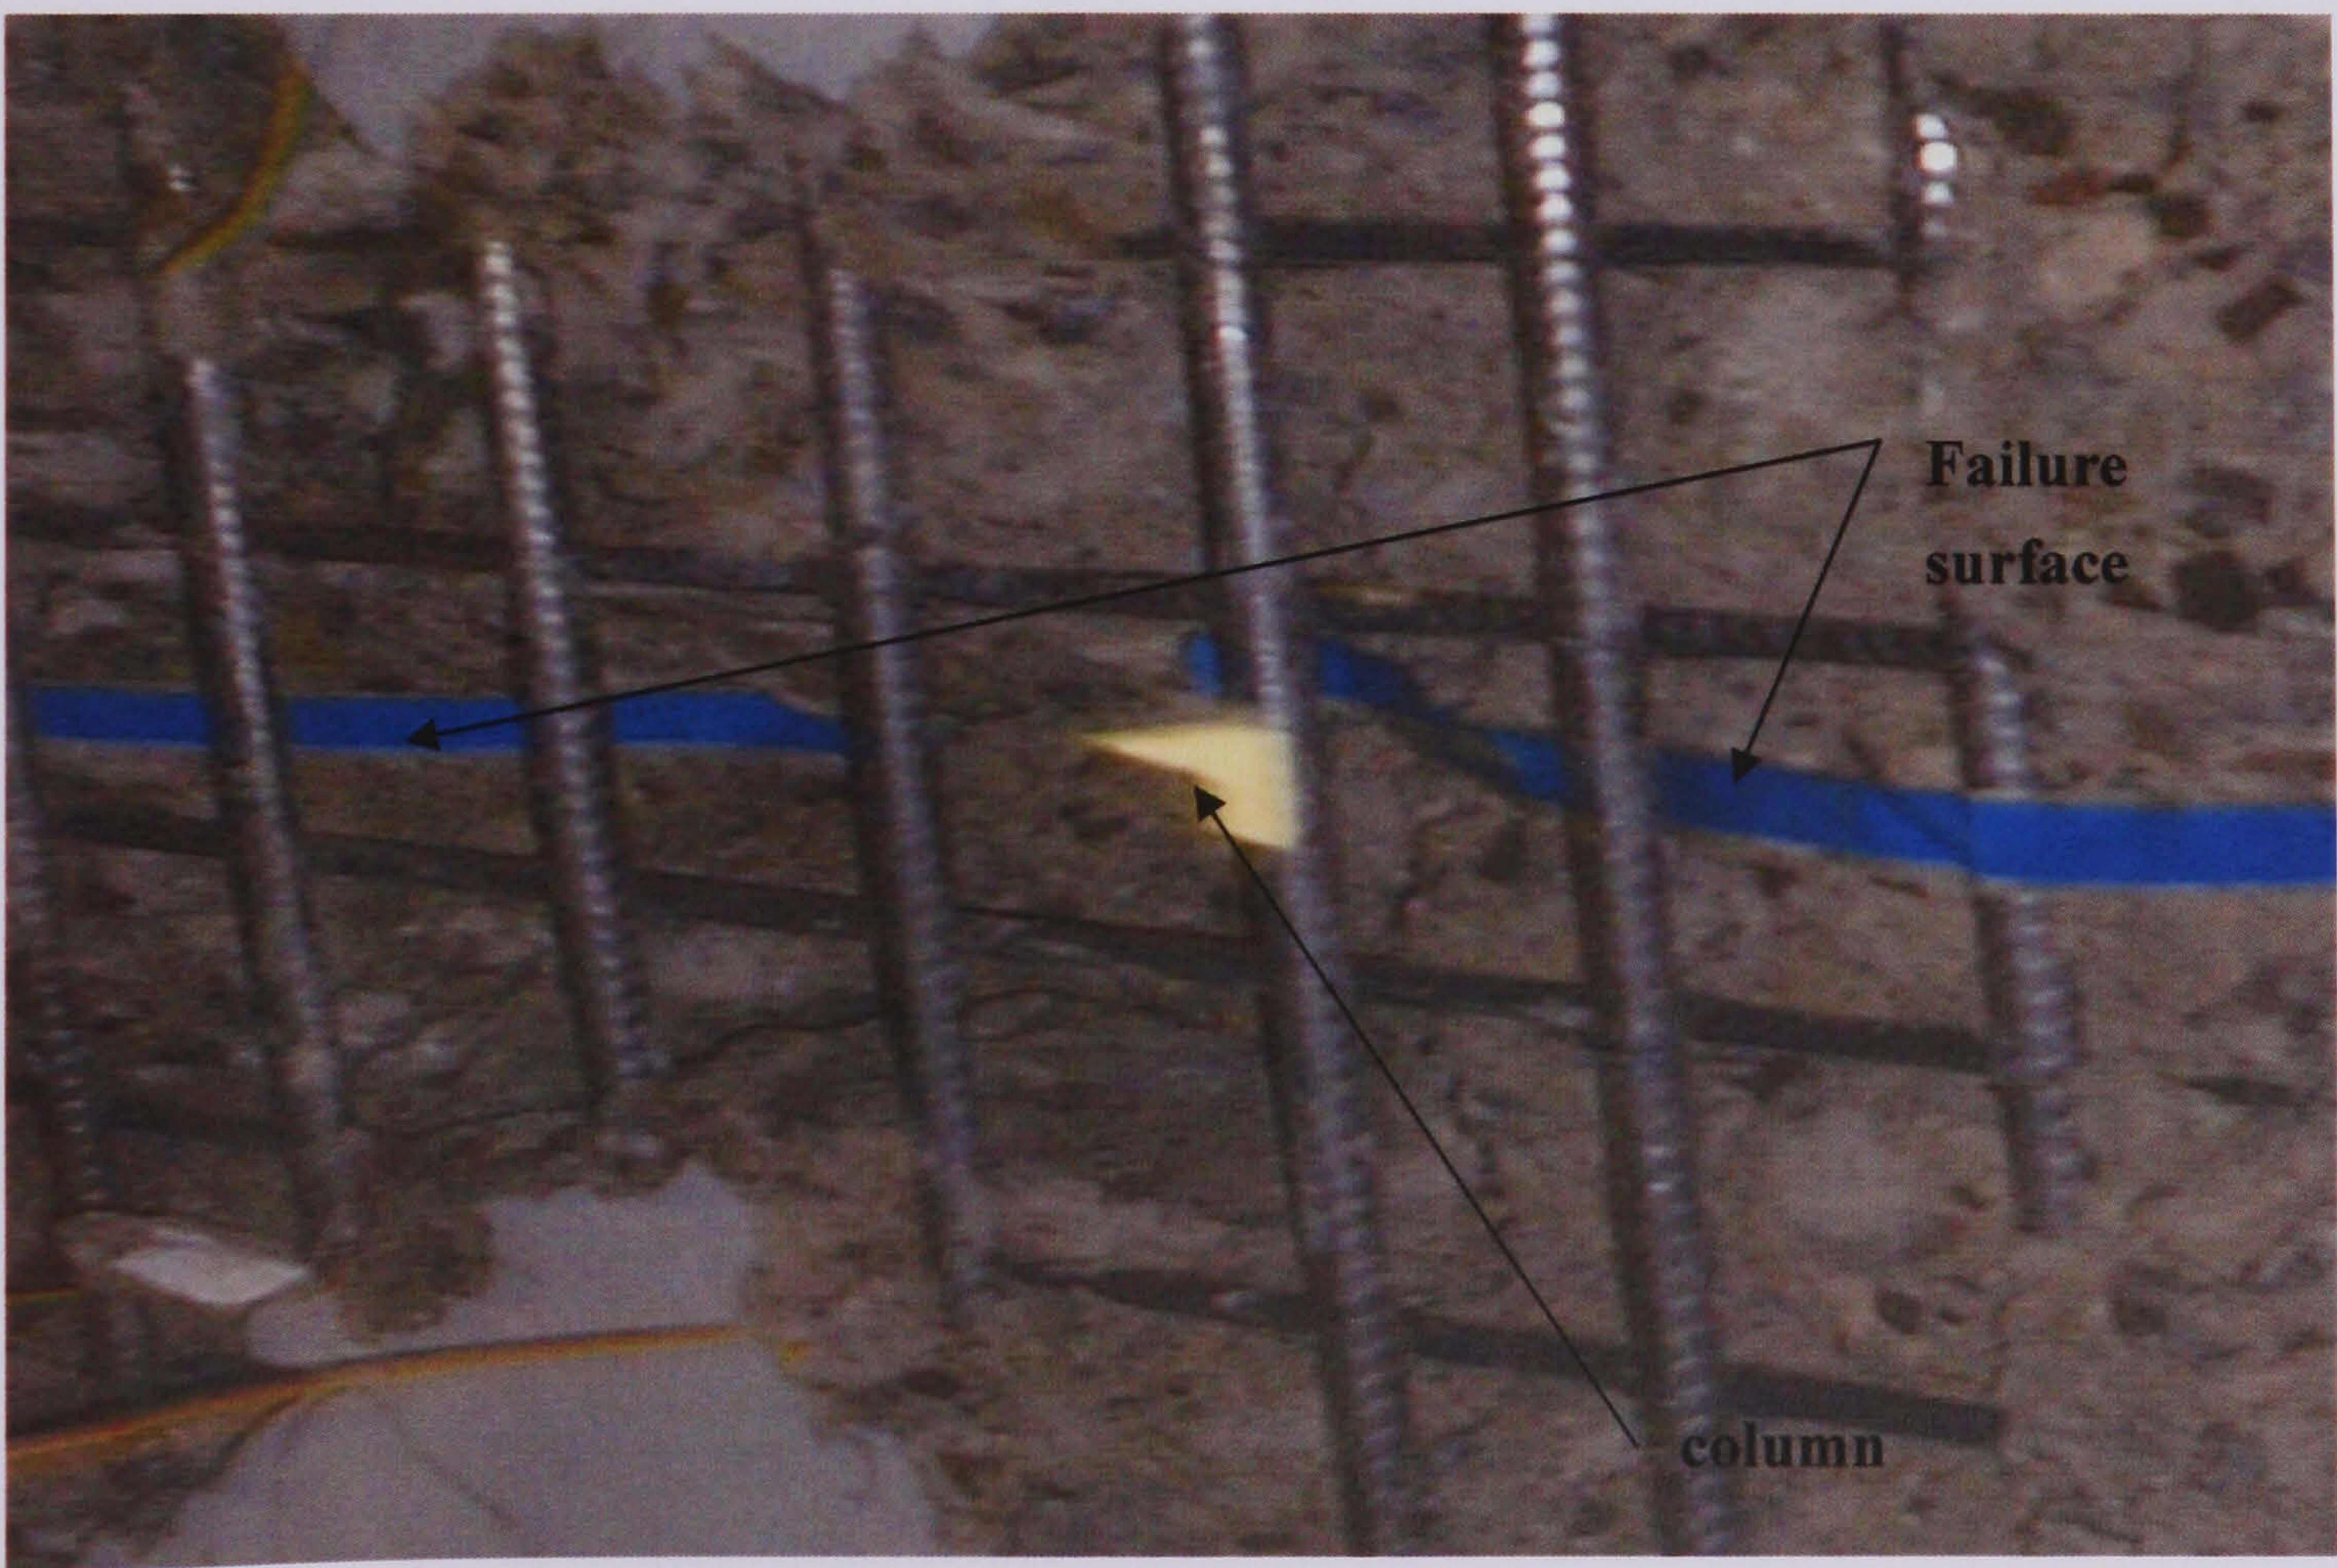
(b) A bottom view showing the profile of the failure surface
